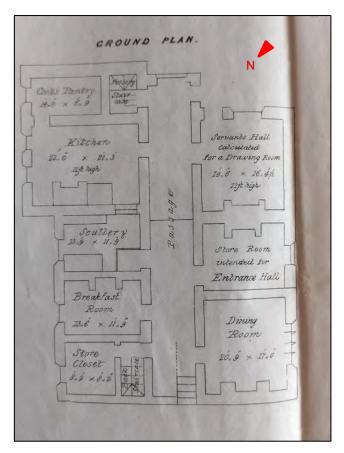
Ground floor plan of Hamilton Lodge, 1845 (ERO ref: D/Det T135)
